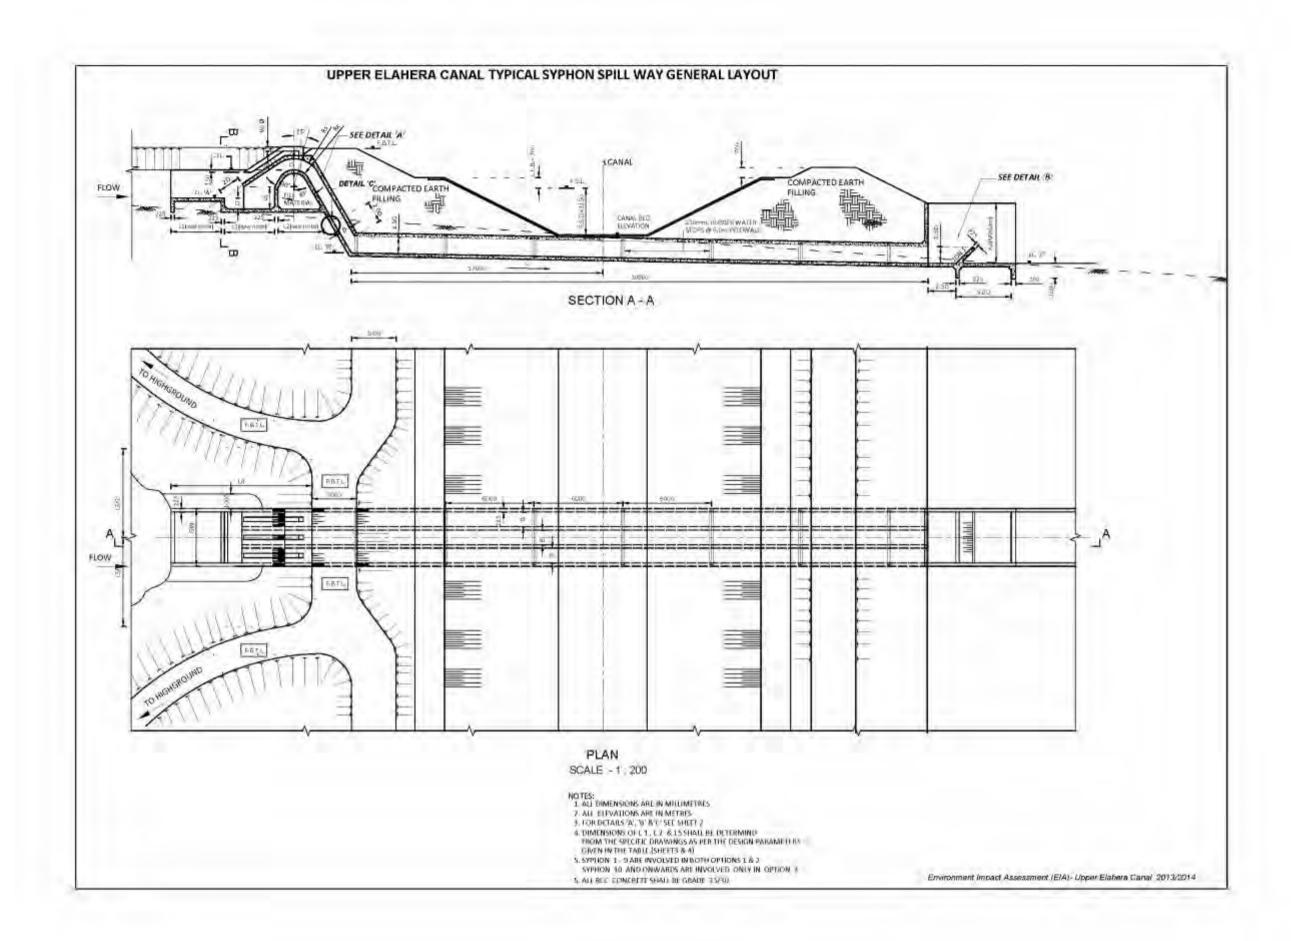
UEC – Typical Syphon Spillway General Layout
